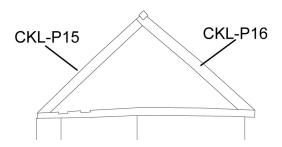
Truss 1 looking east, showing the location of samples CKL-P15 and CKL-P16 (after lan Wells)
